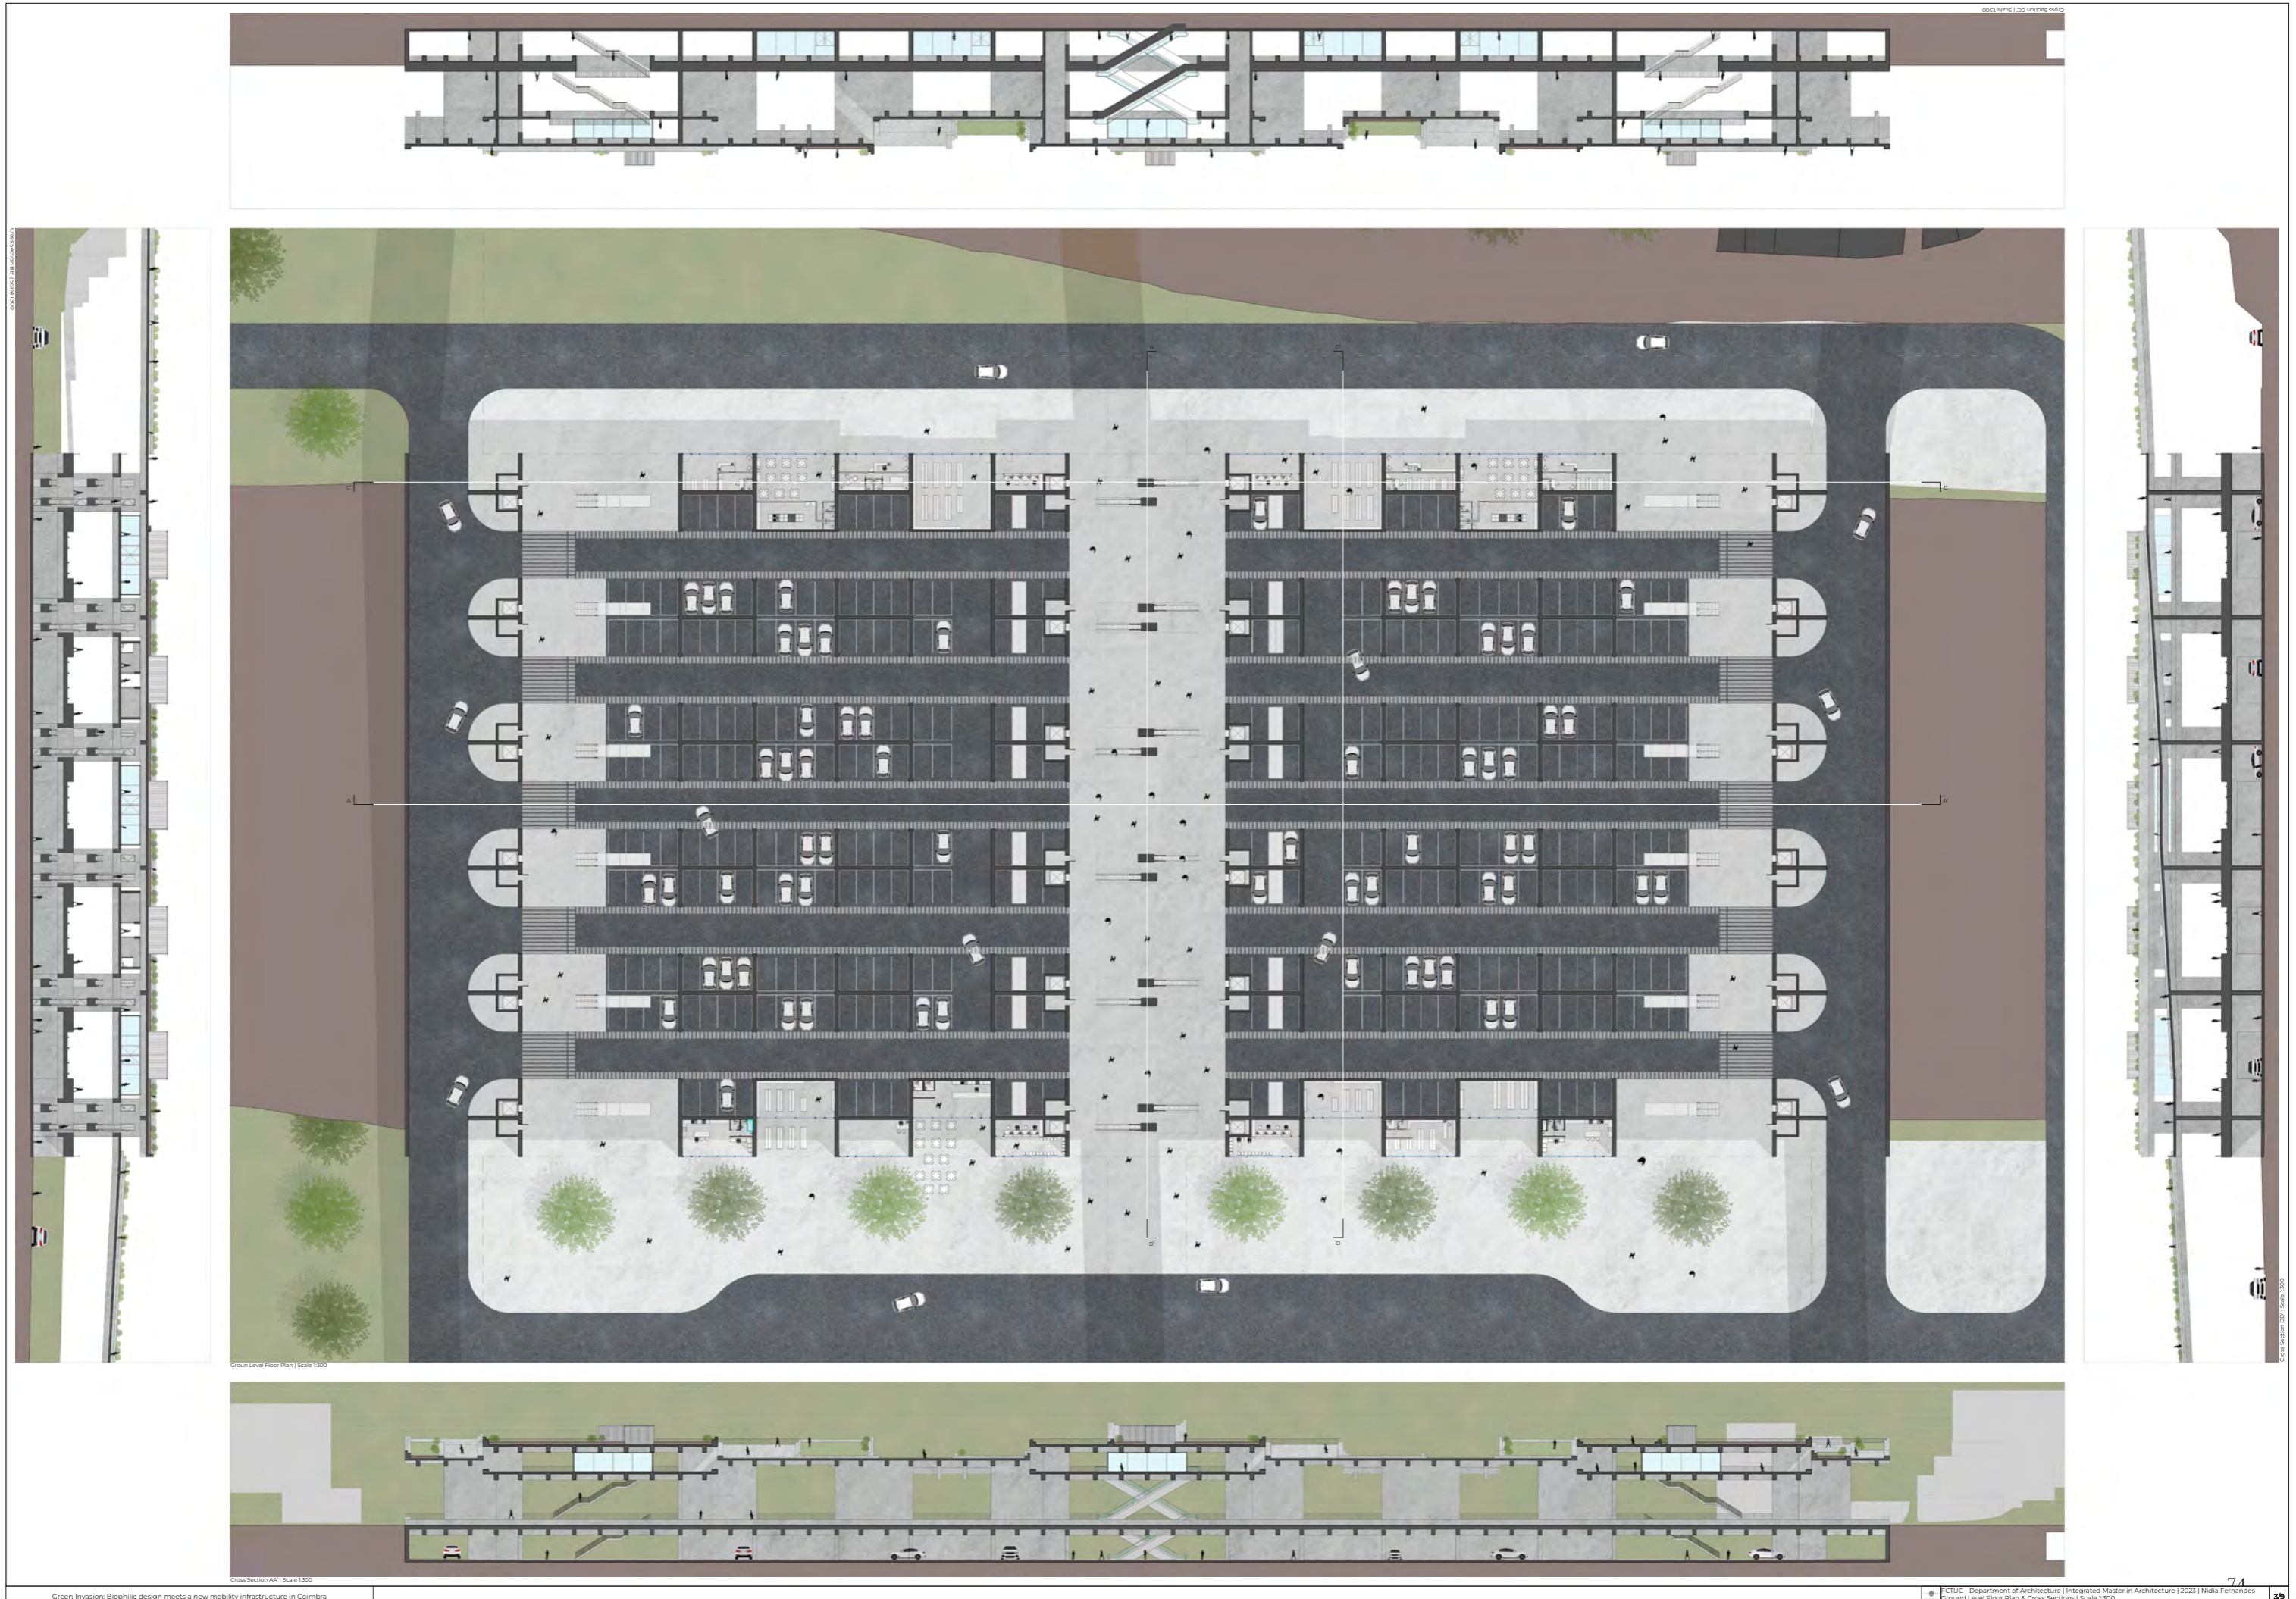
Ground level floor plan and cross sections. (See Panel 3 in annex for full size)
